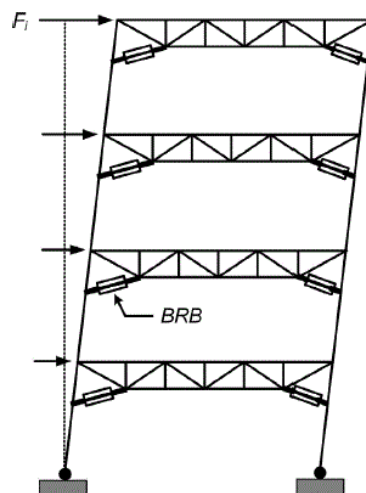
A typical Buckling-Restrained Knee-Braced Truss Moment Frame (Wongpakdee et al., 2014)
